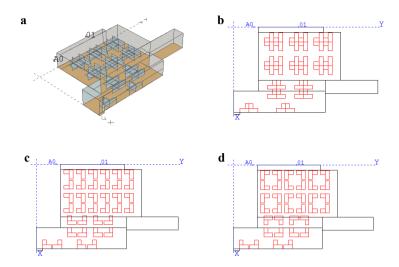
Open-plan office with three types of layout arrangements of workstations (a) office basic scheme; (b) Layout 1; (c) Layout 2; (d) Layout 3.
